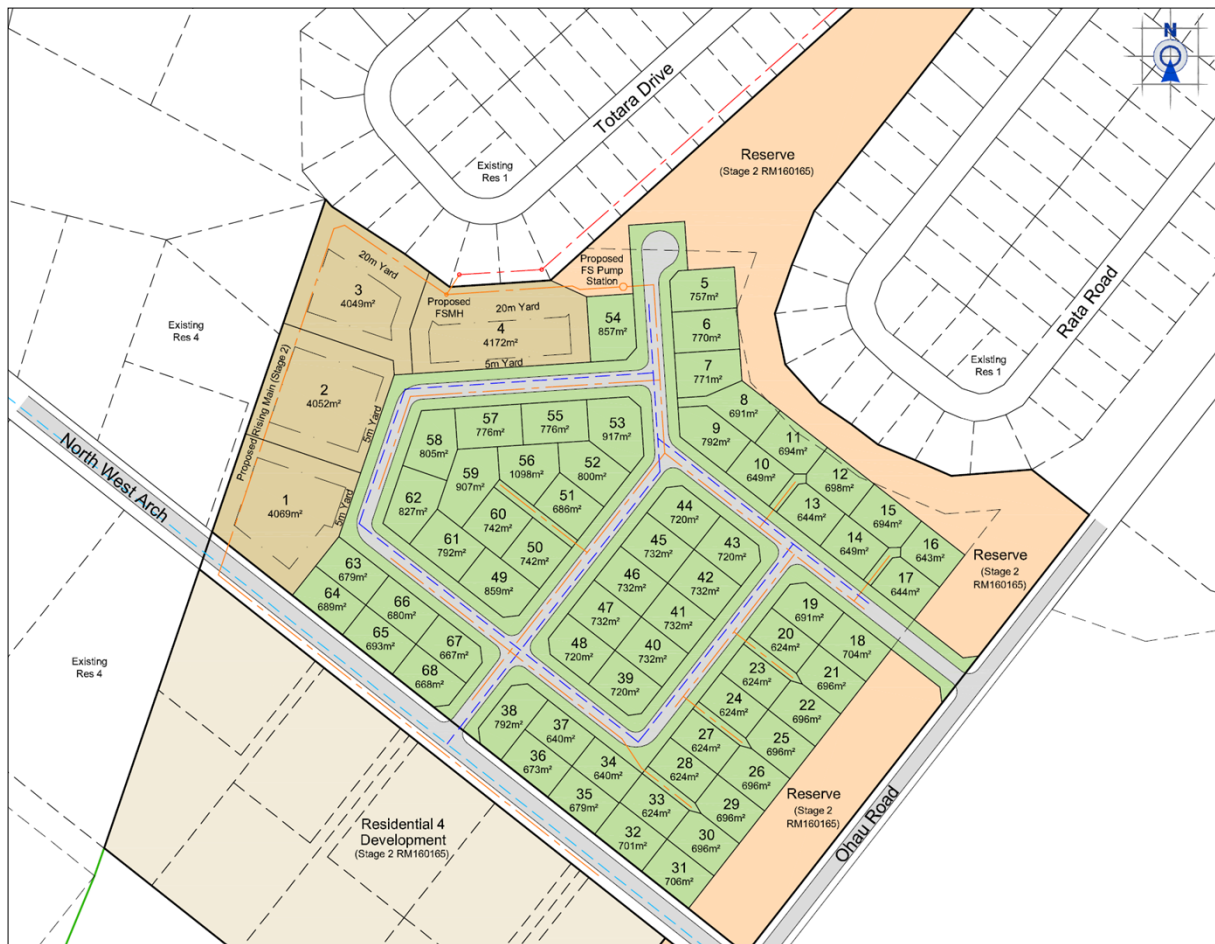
Subdivision Scheme Plan Submitted with RM160290. Lots 1 to 4 are the lots now proposed for further subdivision under RM190181.
